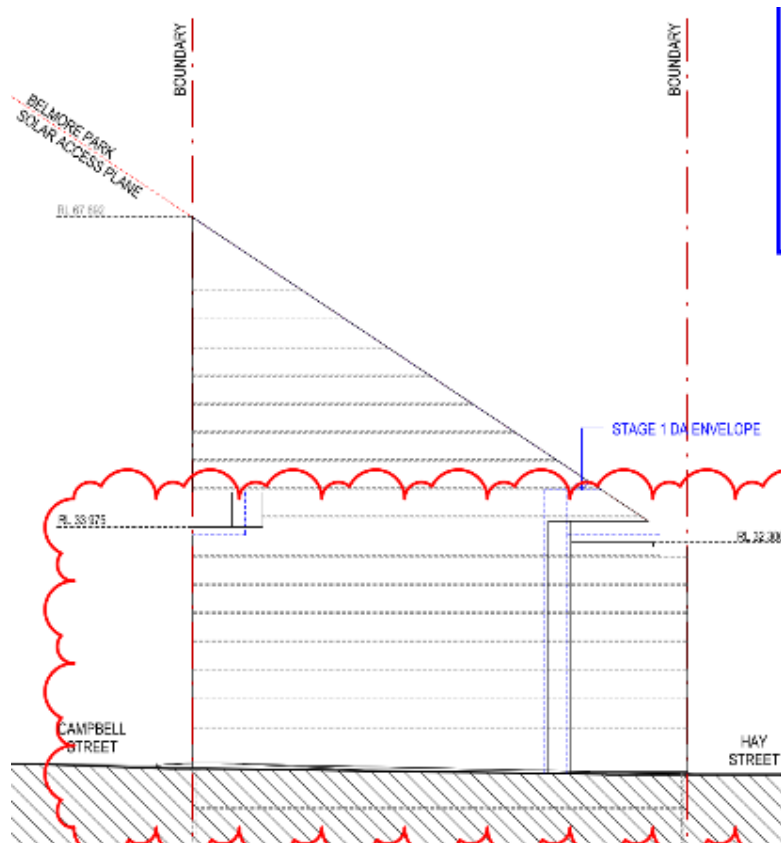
Approved Stage 1 building envelope - D/2015/1490/A
